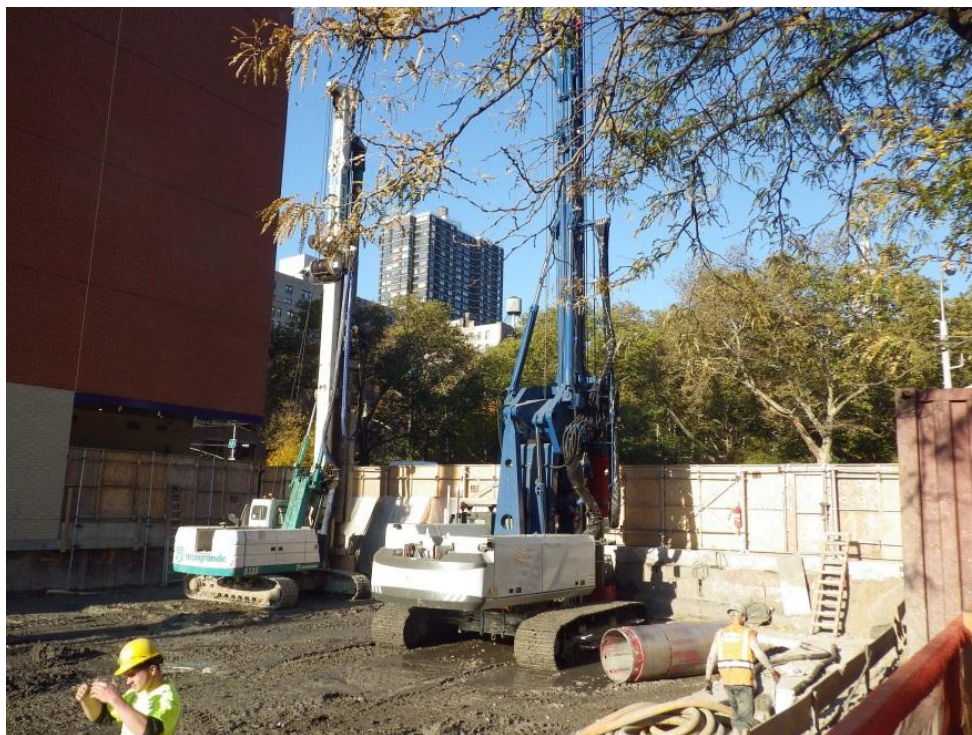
View of SOE excavation along southwest of property in grids 8, 9, and
